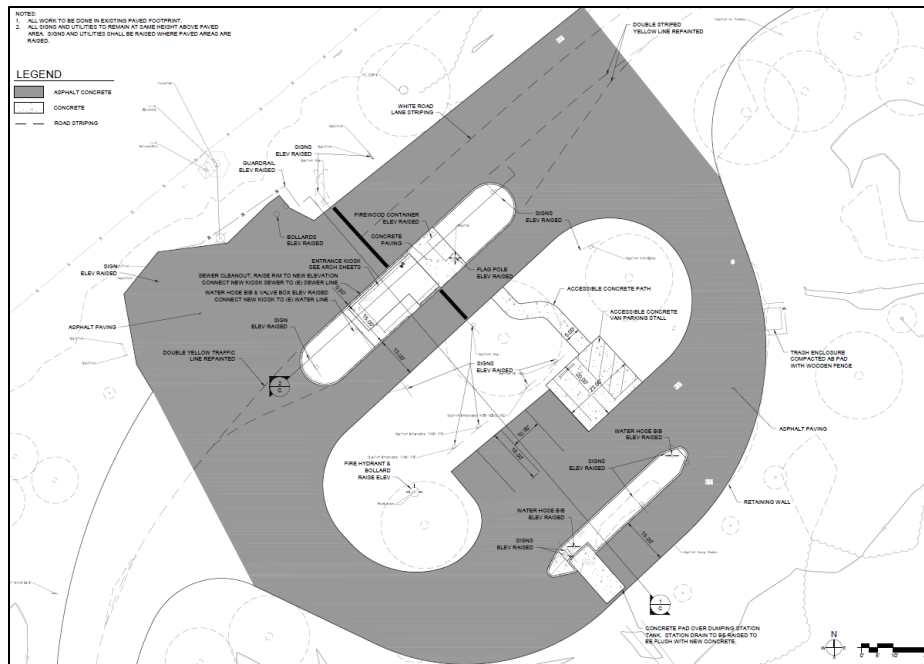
North Beach Campground Facility Improvements Project Site Plan, as shown in Appendix A5
